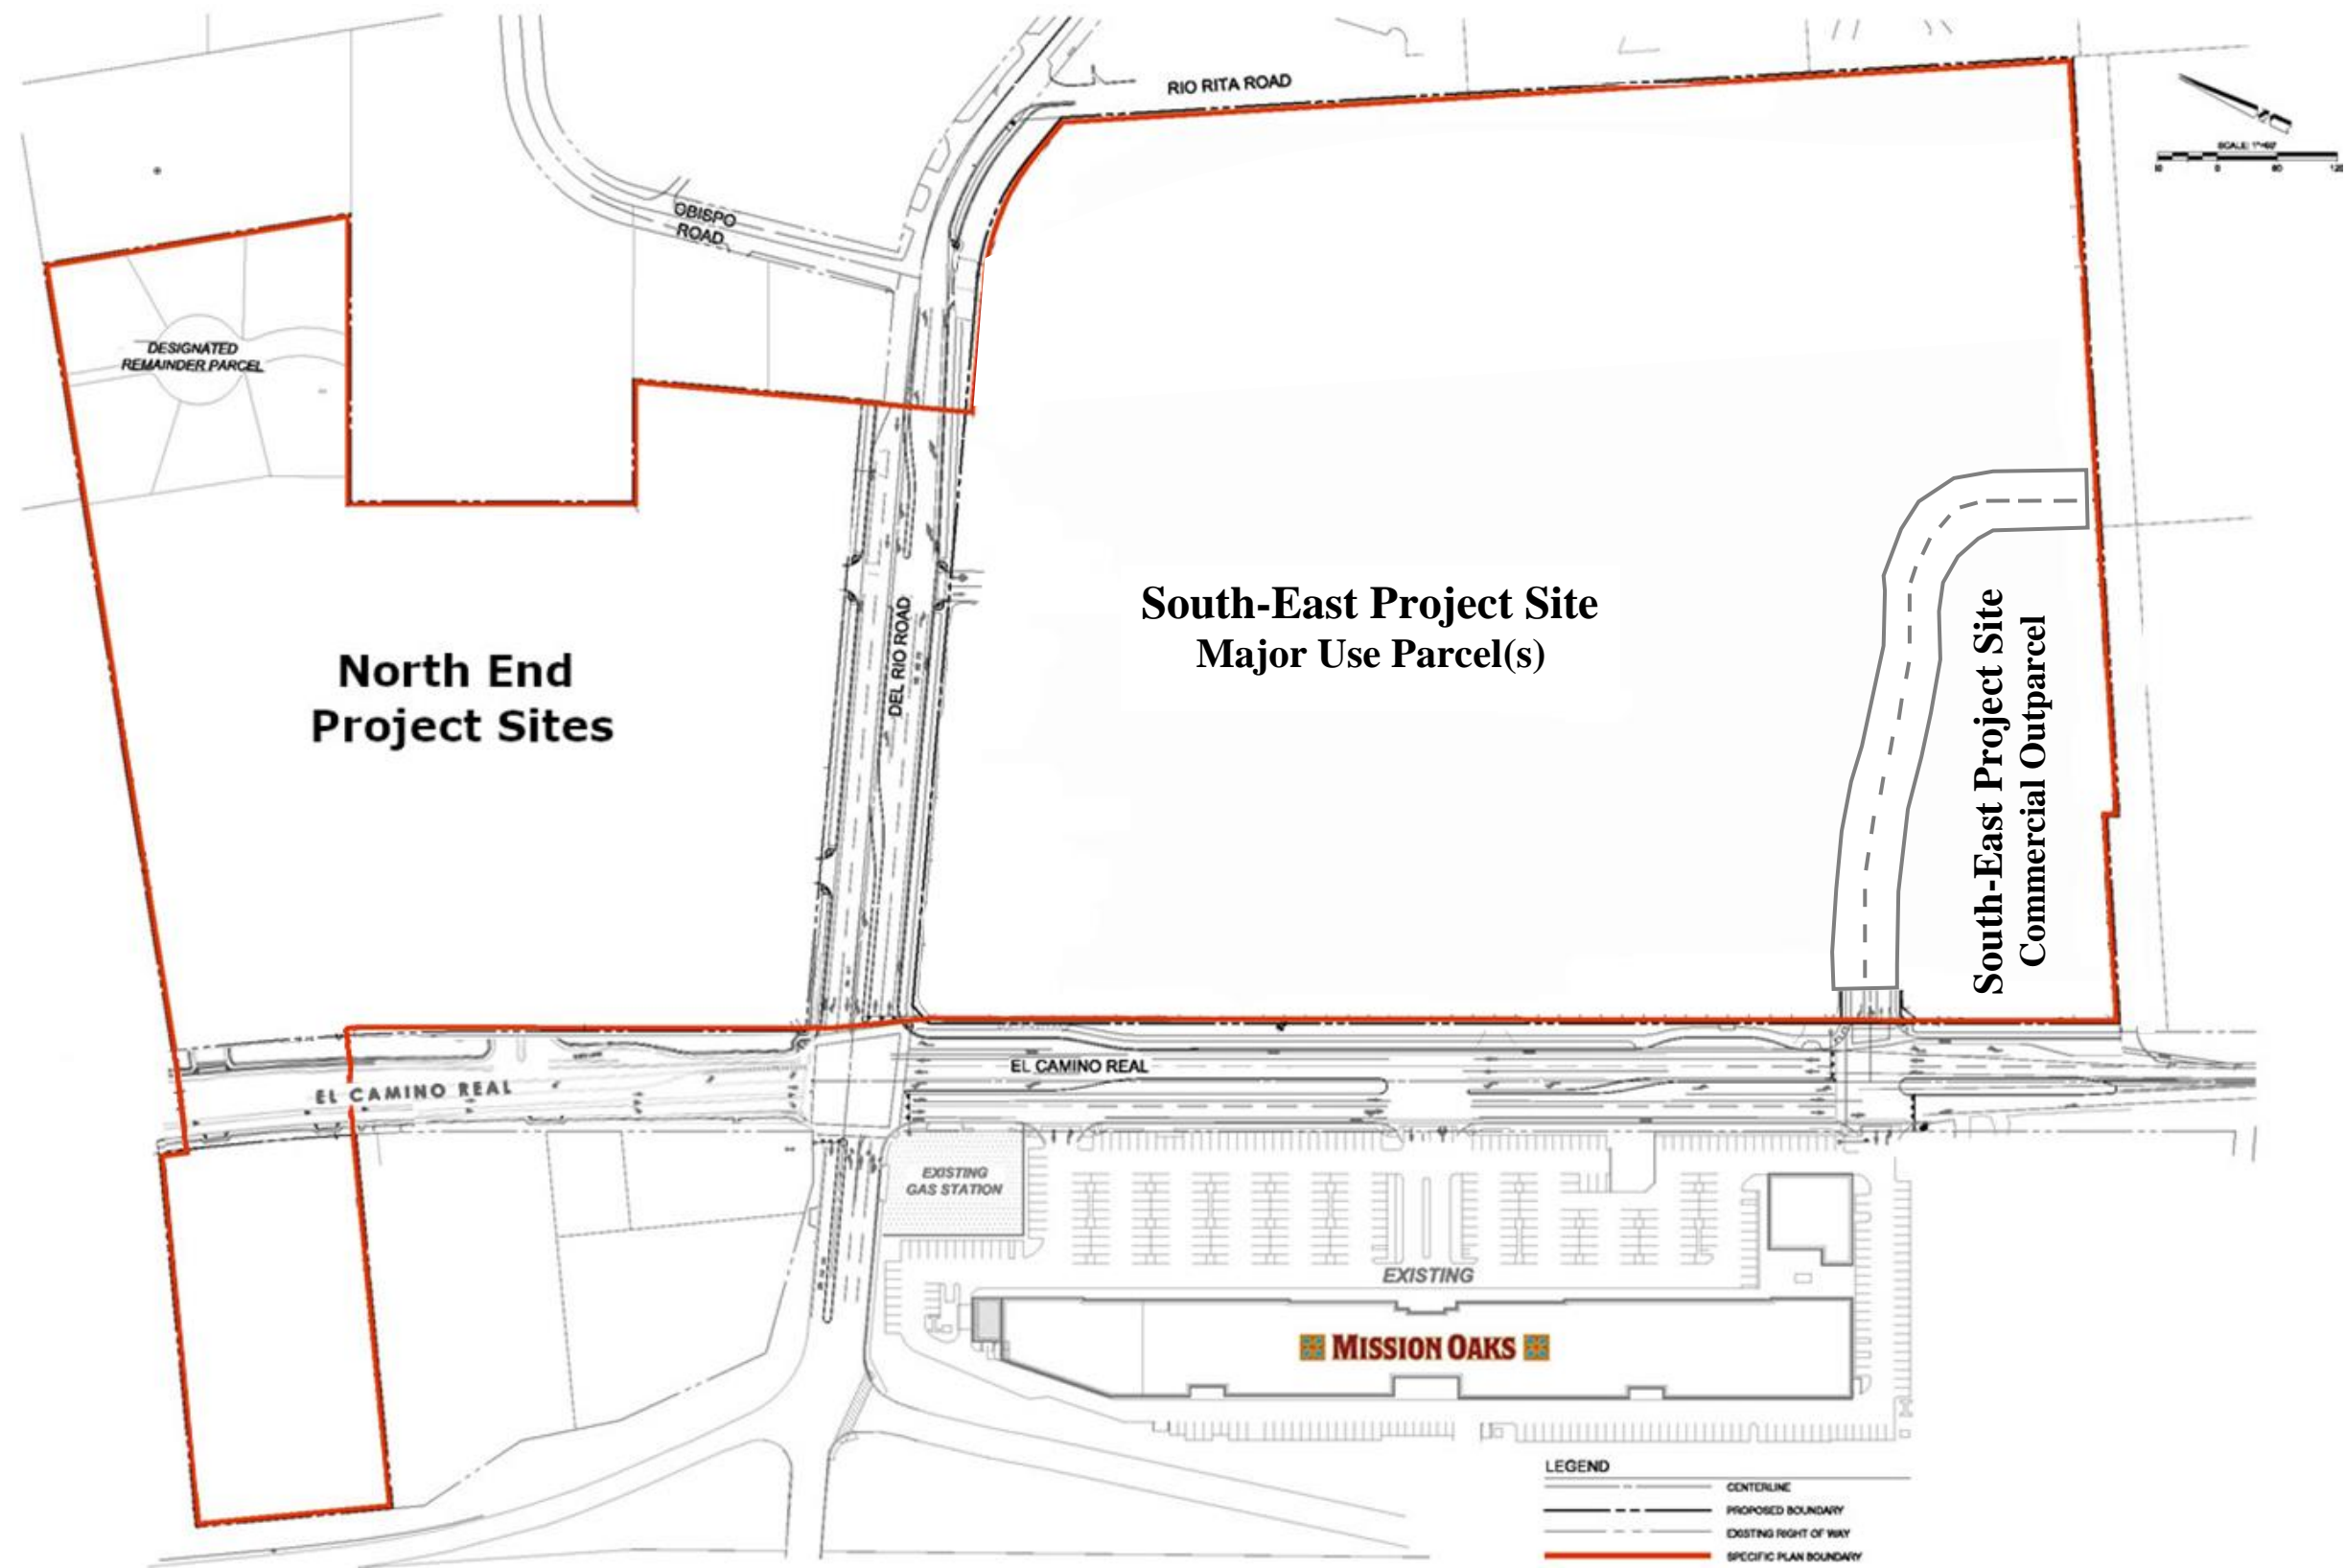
Del Rio Road Commercial Area Specific Plan Conceptual Plan
